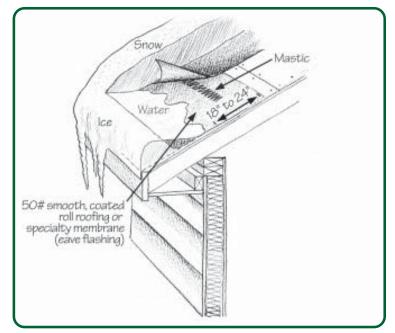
Eave Flashing for Preventing Ice Dams
